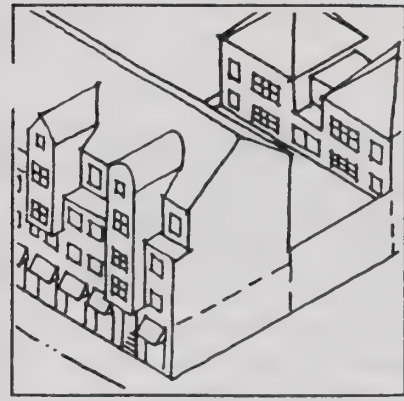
Orient Buildings to Streets, Rather than Parking Lots
